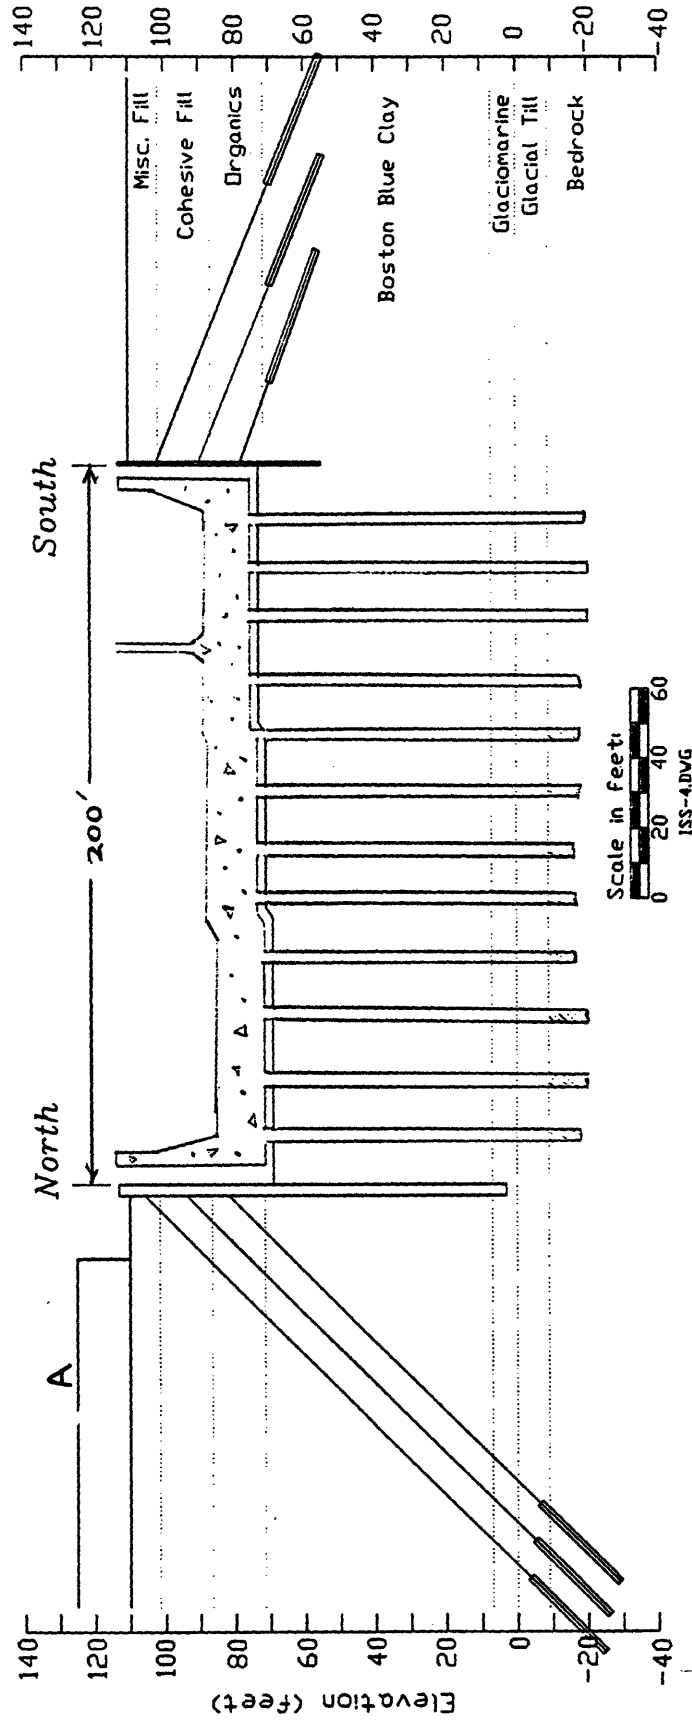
Cross-Section A-A from Figure 3.1, Through the Boat Section (Station 77+00), Showing Two Types of Support Wall: a Diaphragm (Slurry) Wall on the North and a Sheetpile Wall on the South.
